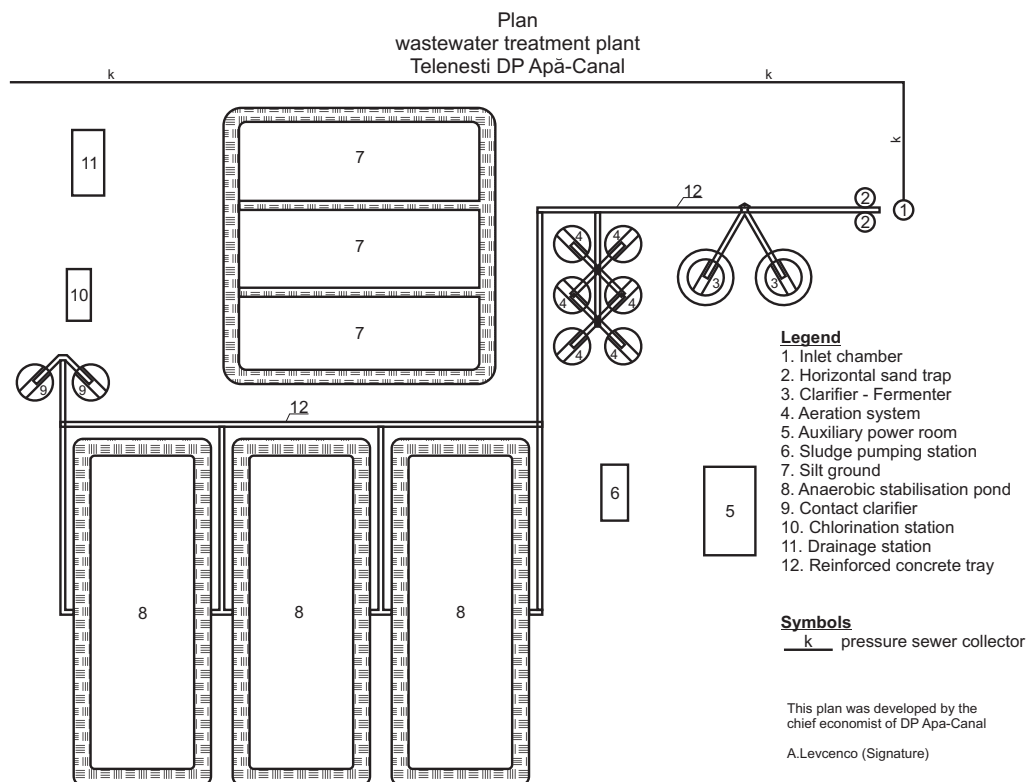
Schematic plan of wastewater treatment plant (Levenco)
